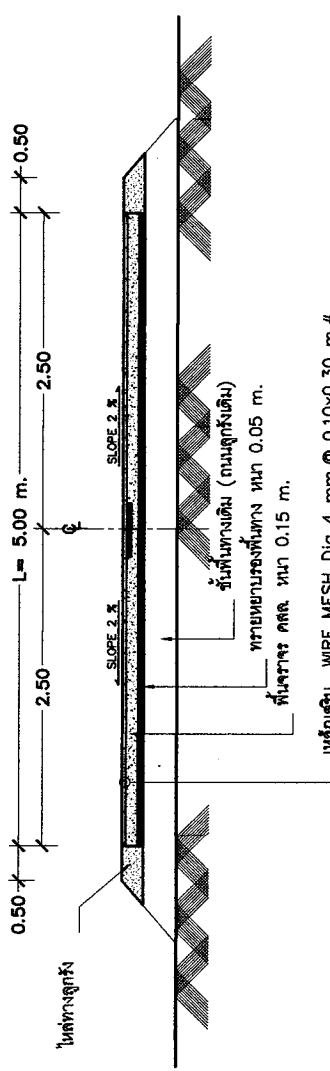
LONGITUDINAL JOINT (รอยต่อตามยาว)
